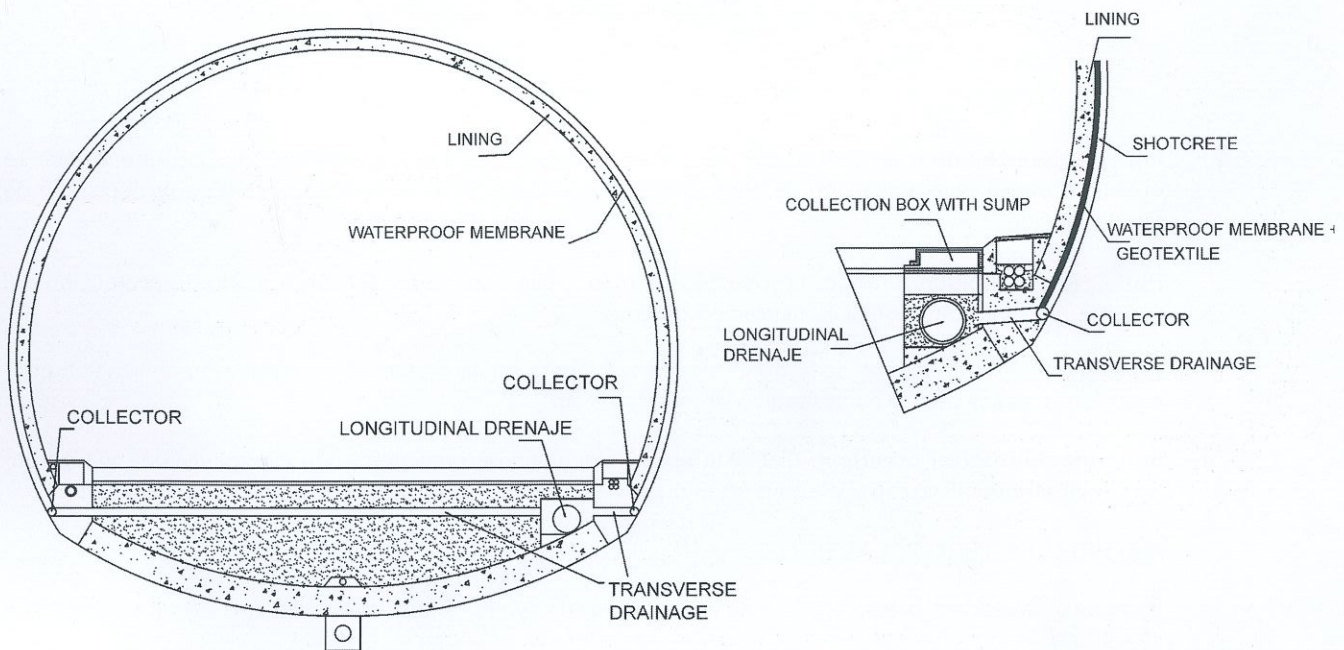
Cross-sections of traditional tunnel waterproofing and drainage
